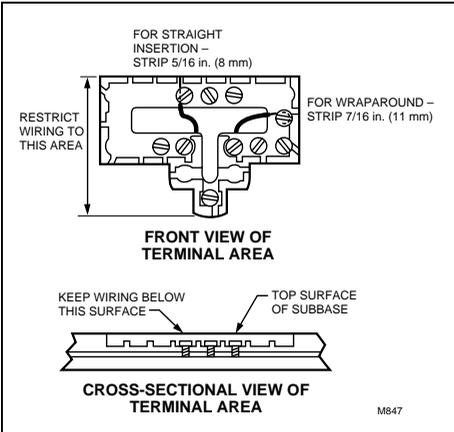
Restrict wiring to recessed area surrounding terminals.
